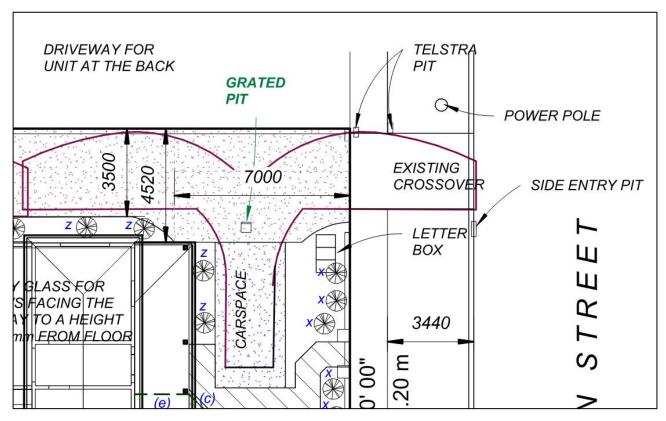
Site access and access width (Weed Drafting & Building Consultants Pty Ltd, 2023)
